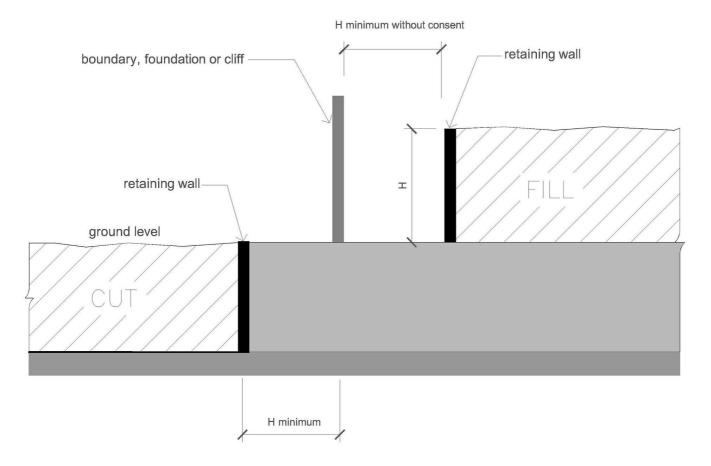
B Cut and fill supported by retaining walls (elevation view)
